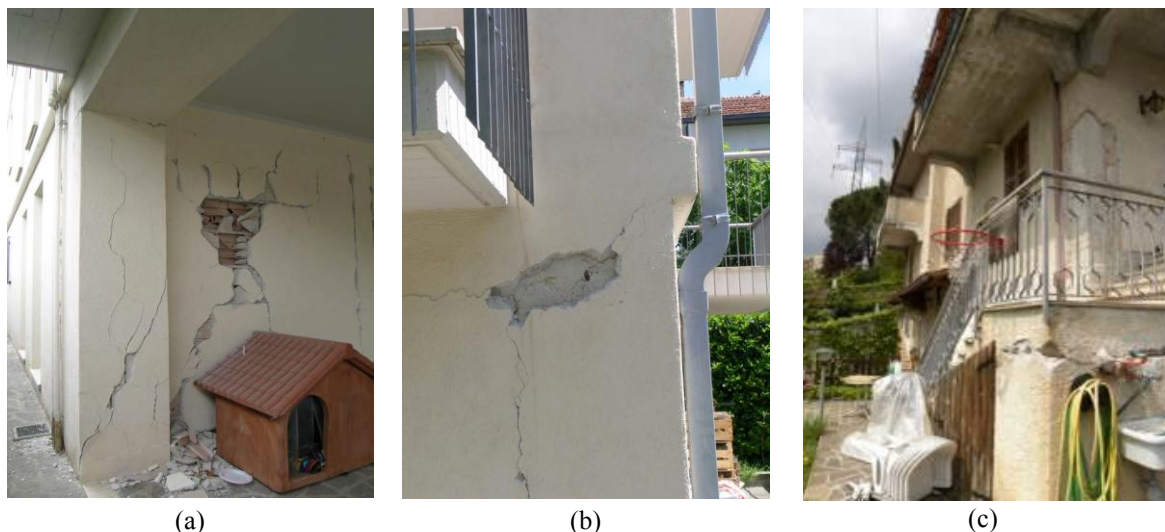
L'Aquila 2009 earthquake damage: severe damage to exterior infill (a); cracking of a corner beam-column joint (b); damage to stairs and short columns (c).
